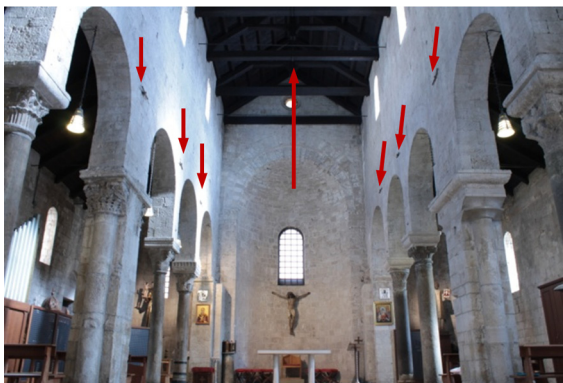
Interior of S. Gregory Church showing the wooden trusses and the metallic ties above the pillars and columns.
